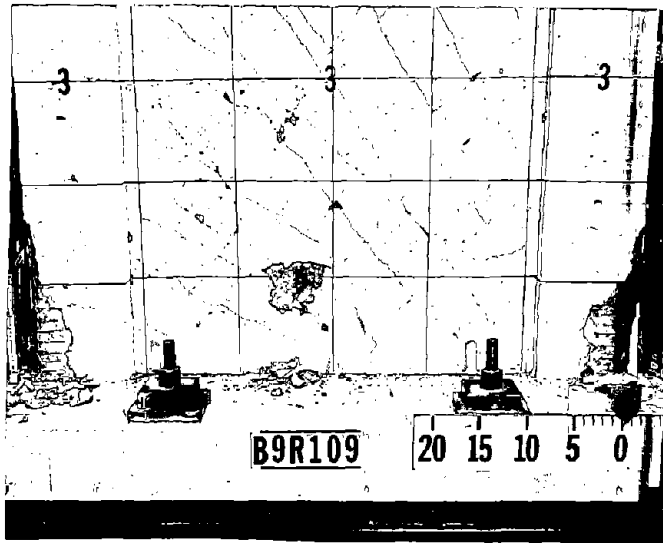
Spalling in the Web of Specimen B9R Caused by Buckling of Vertical Reinforcement
